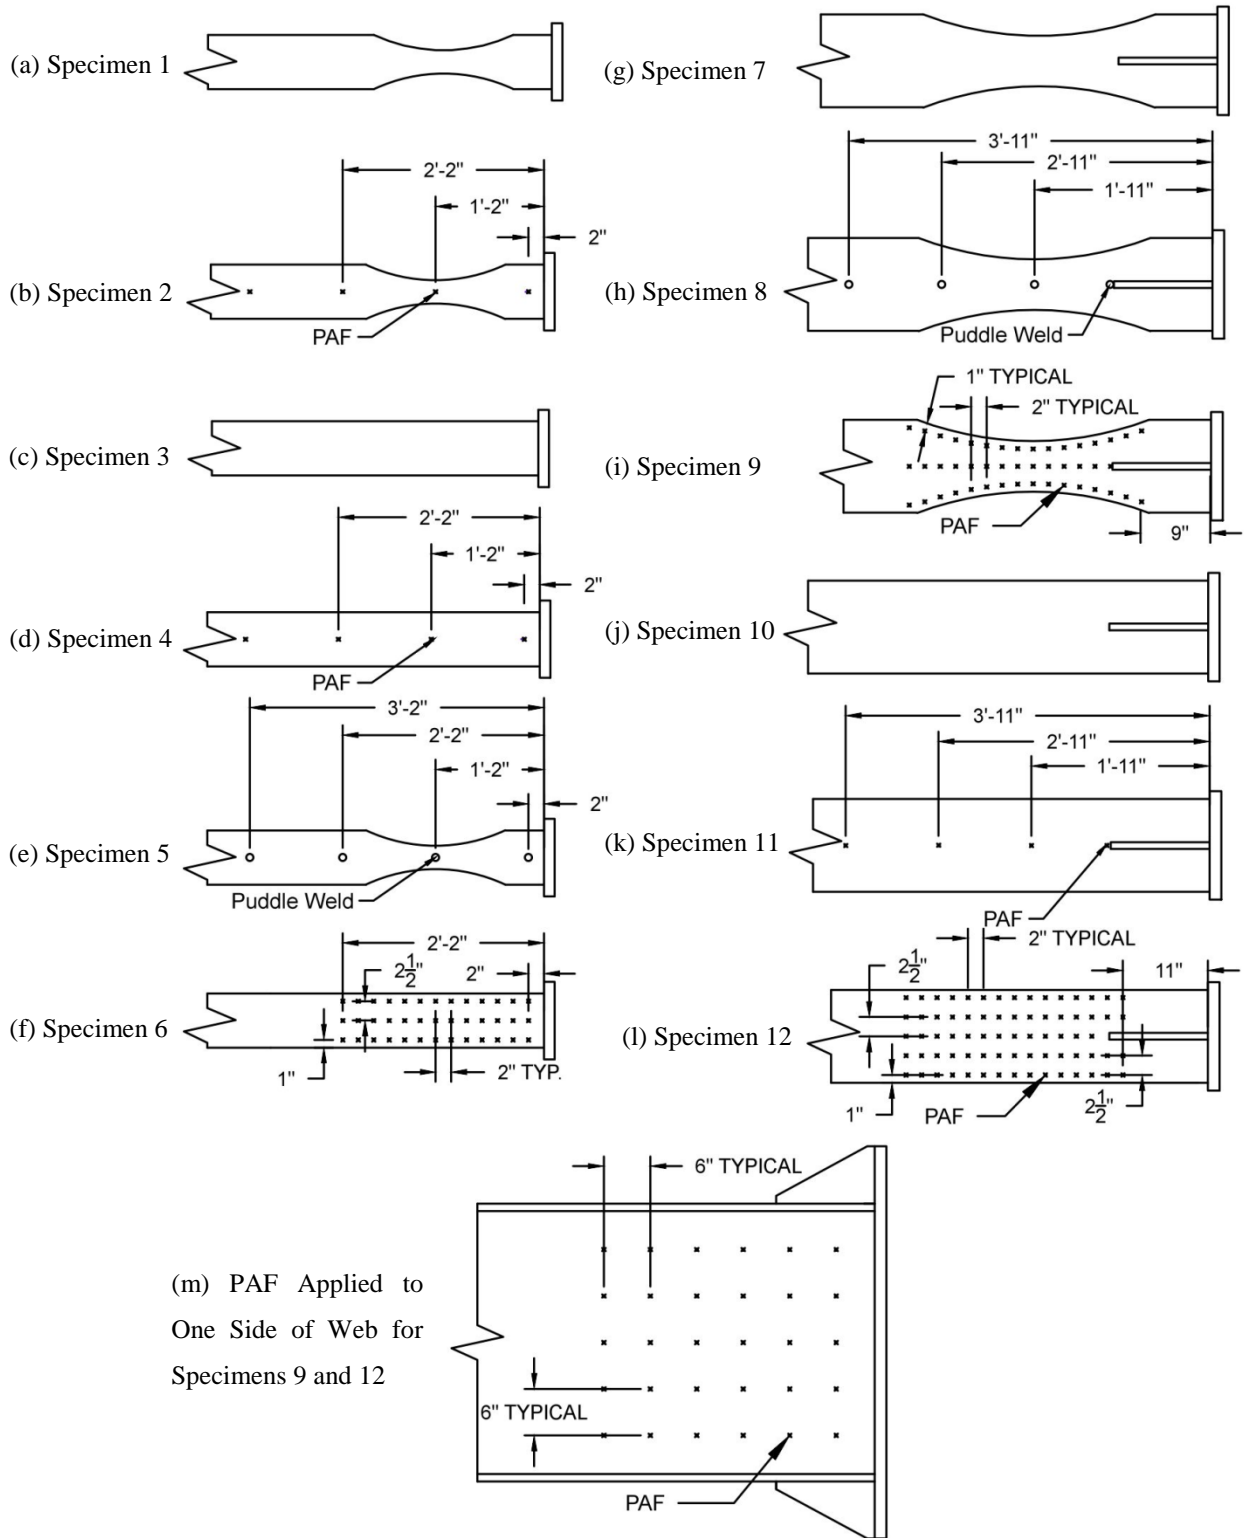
Layout of Fasteners for the 12 Specimens
